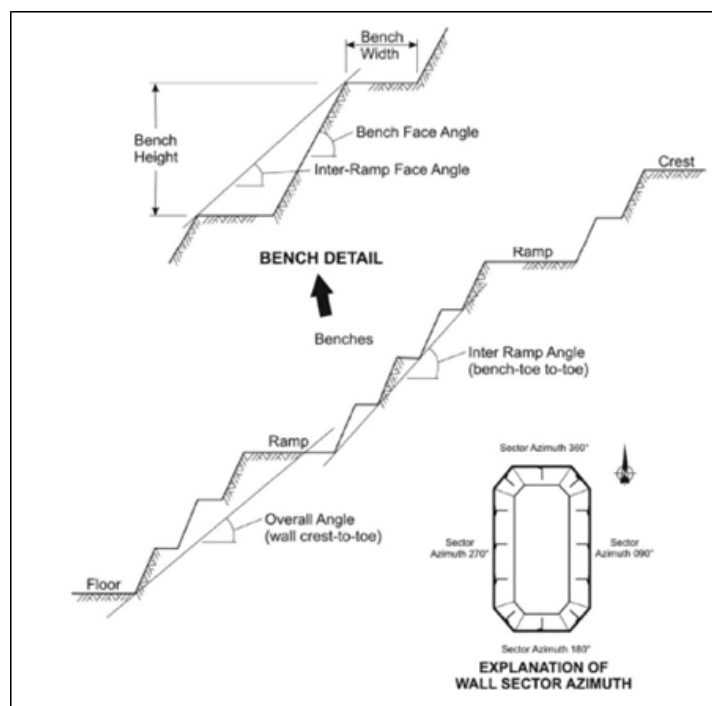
Pit Slope Configuration Illustration (Read and Stacey, 2009)
